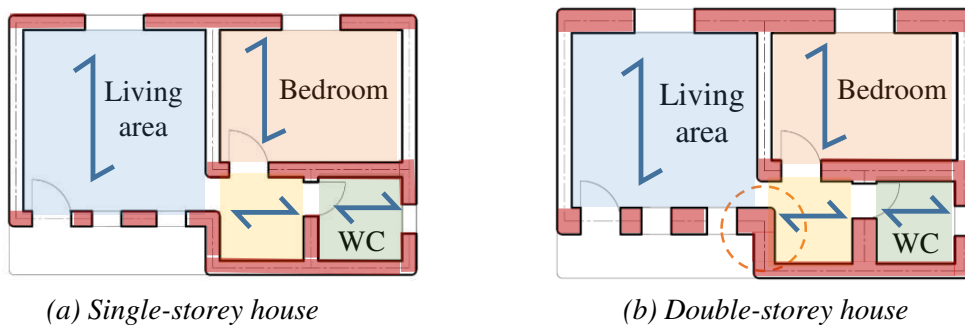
Floor plan showing the minimum required wall sizes walls to scale. (Shown for pattern type A for illustrative purposes)
